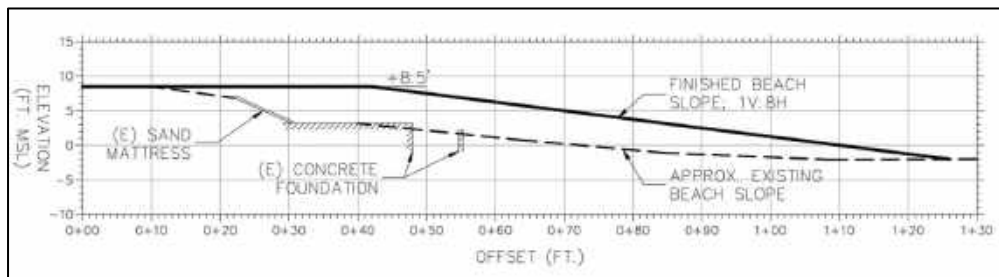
Section view of proposed beach fill covering Waikiki Tavern Foundation
